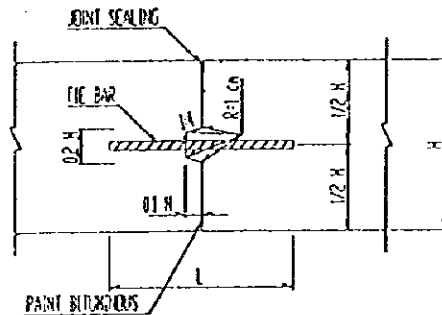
Structure of Longitudinal Construction Joint (with tie bar)
